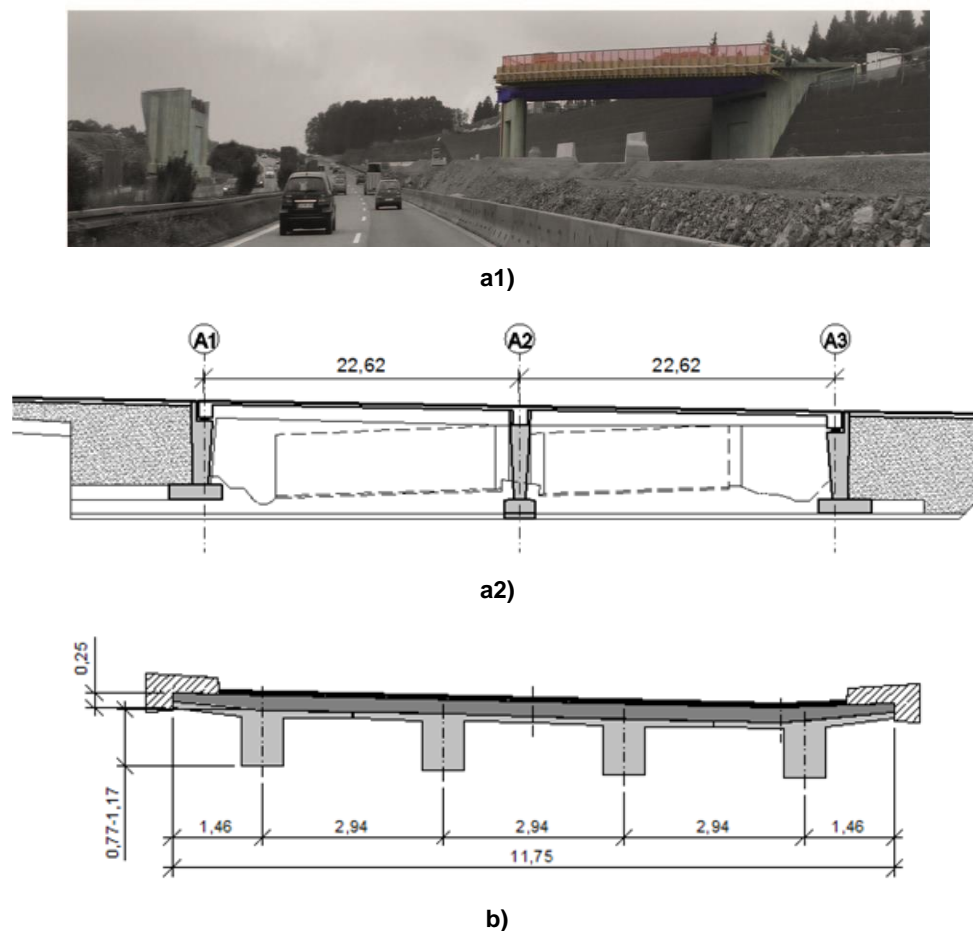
Case A2: Prestressed cast in-situ concrete girder. a1) and a2) Longitudinal view; b) Cross section with girders of variable height.
